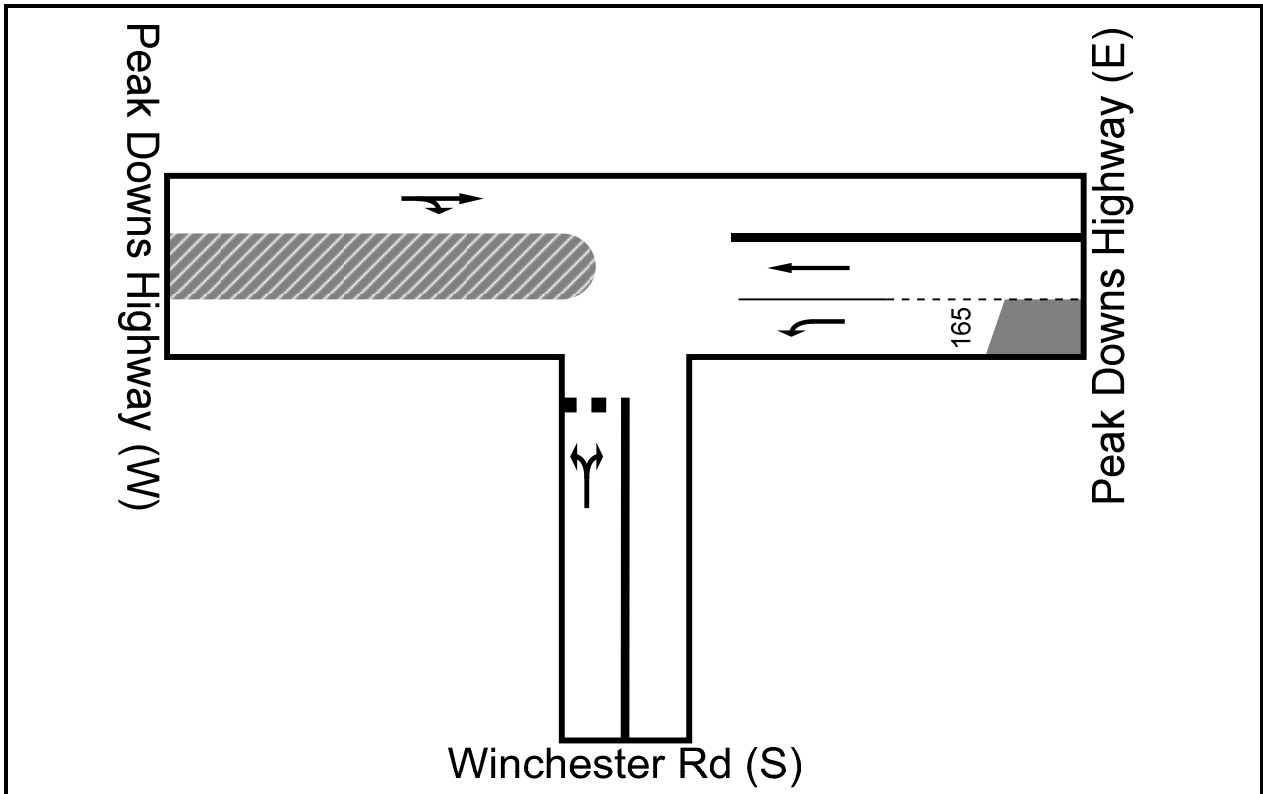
Winchester Road/Peak Downs Highway (Existing Intersection Layout)
